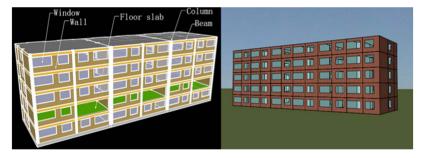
Models of the retrofitted building in Revit (left) and IESVE (right).
